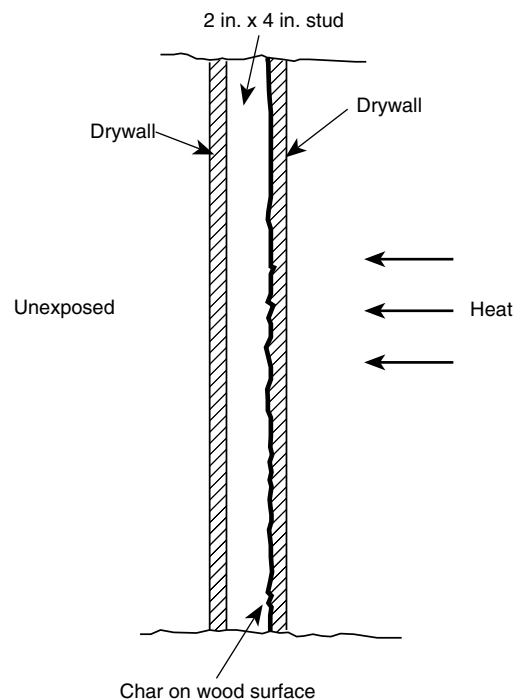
Charring of wooden structural elements by heat conduction through wall surface material.
